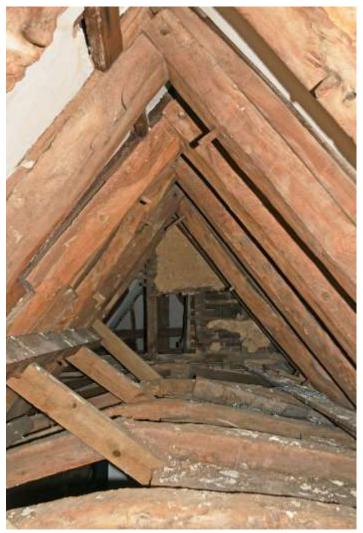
View between collars and apex of the roof above Room S-04, looking toward the northern chimneybreast
